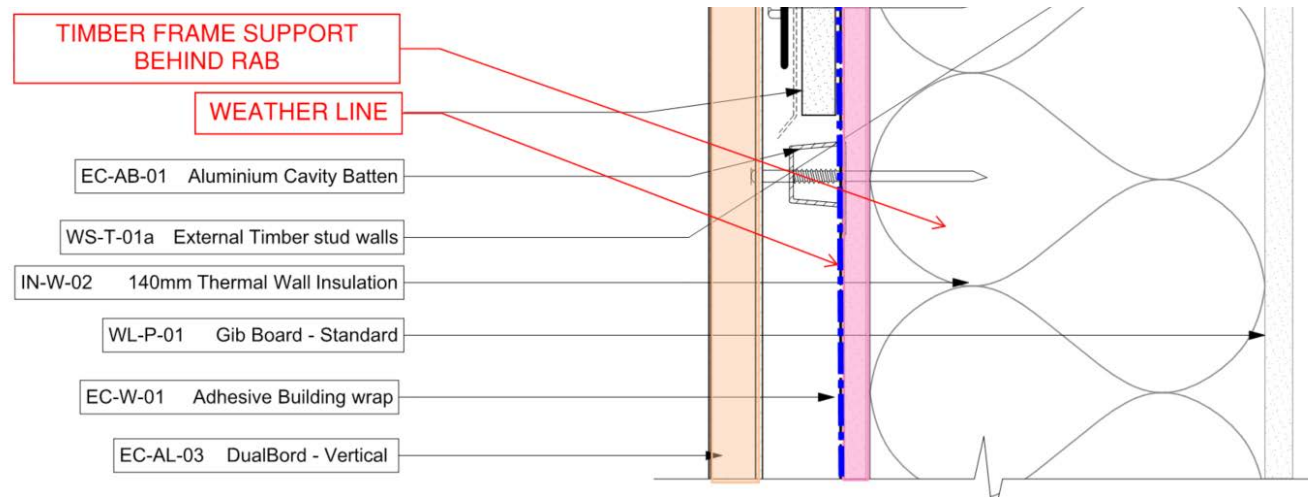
Typical external envelope make-up with aluminium cladding. Snapshot from Pacific Environments architectural Drawing A424 det 53
